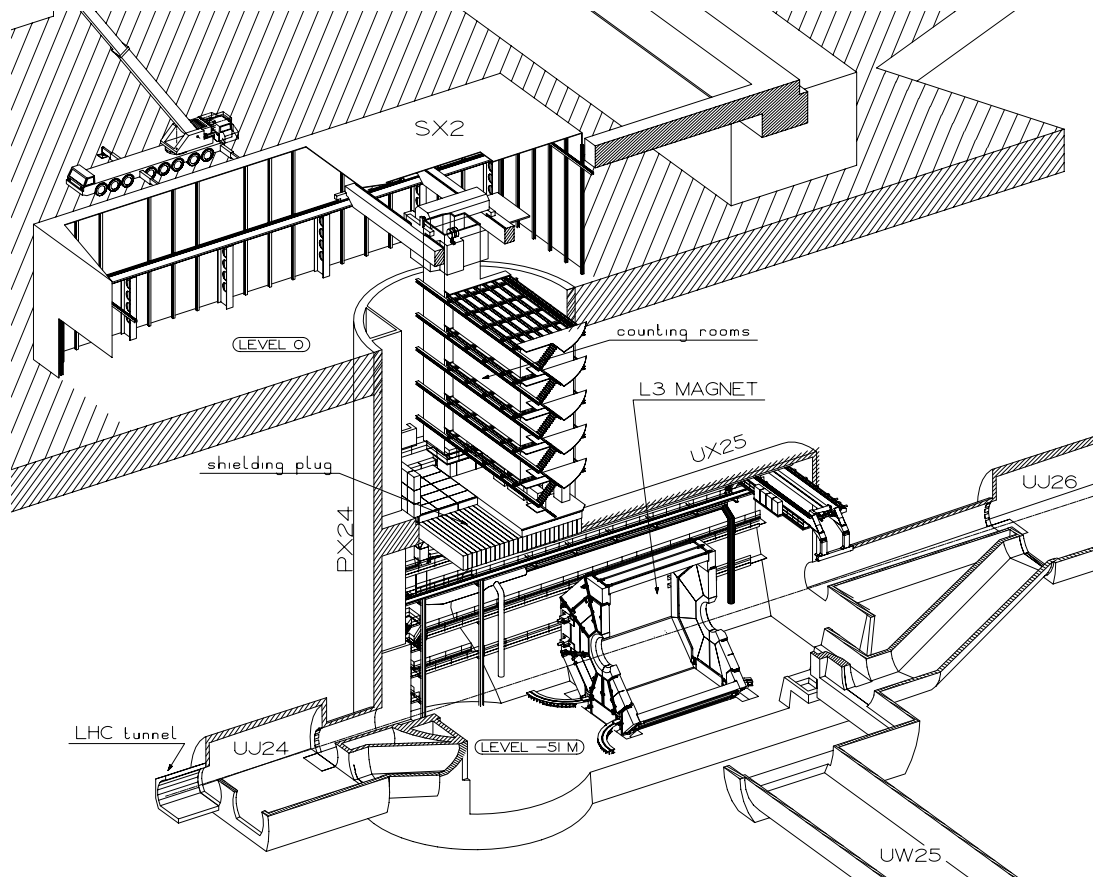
General layout of the basic underground structures at Point 2, showing the L3 magnet and the counting rooms.
